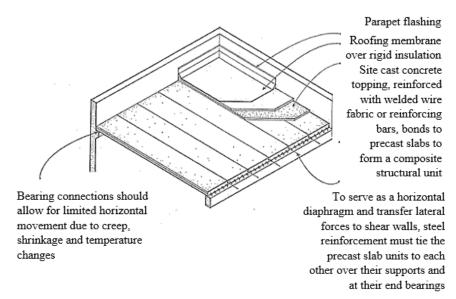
Flat reinforced concrete roof (Ching & Adams, 2001)
